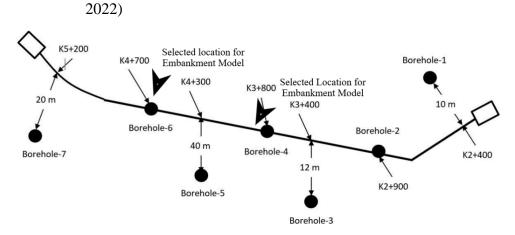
Layout and location of soil exploration of embankment for Bangabandhu Sheikh Mujib Shilpa Nagar.
